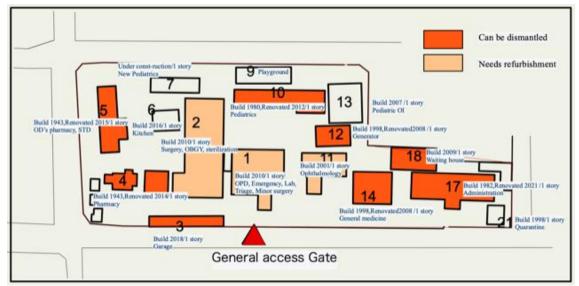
Existing Site Plan of Stung Treng Provincial Hospital
